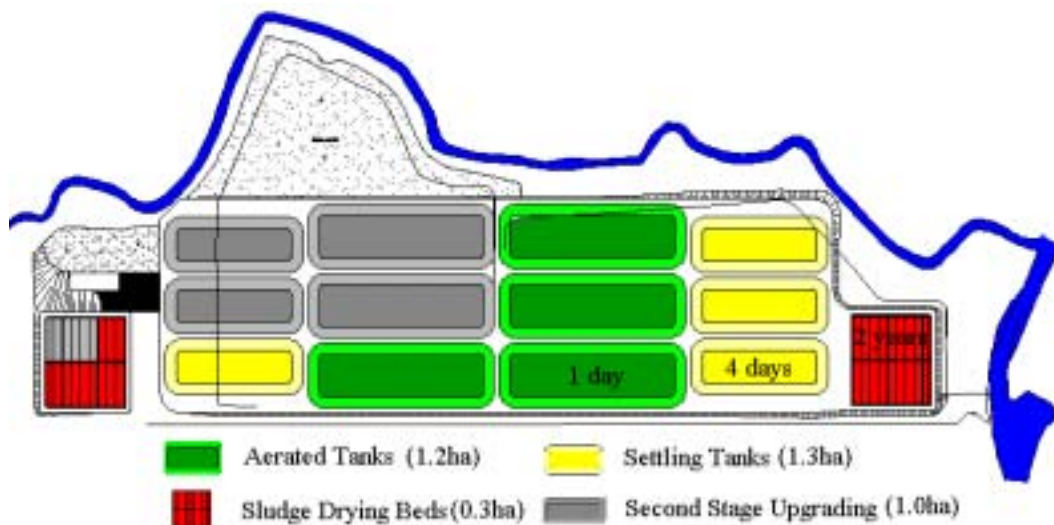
Layout of Alternative 1 (SABESP's Design)
